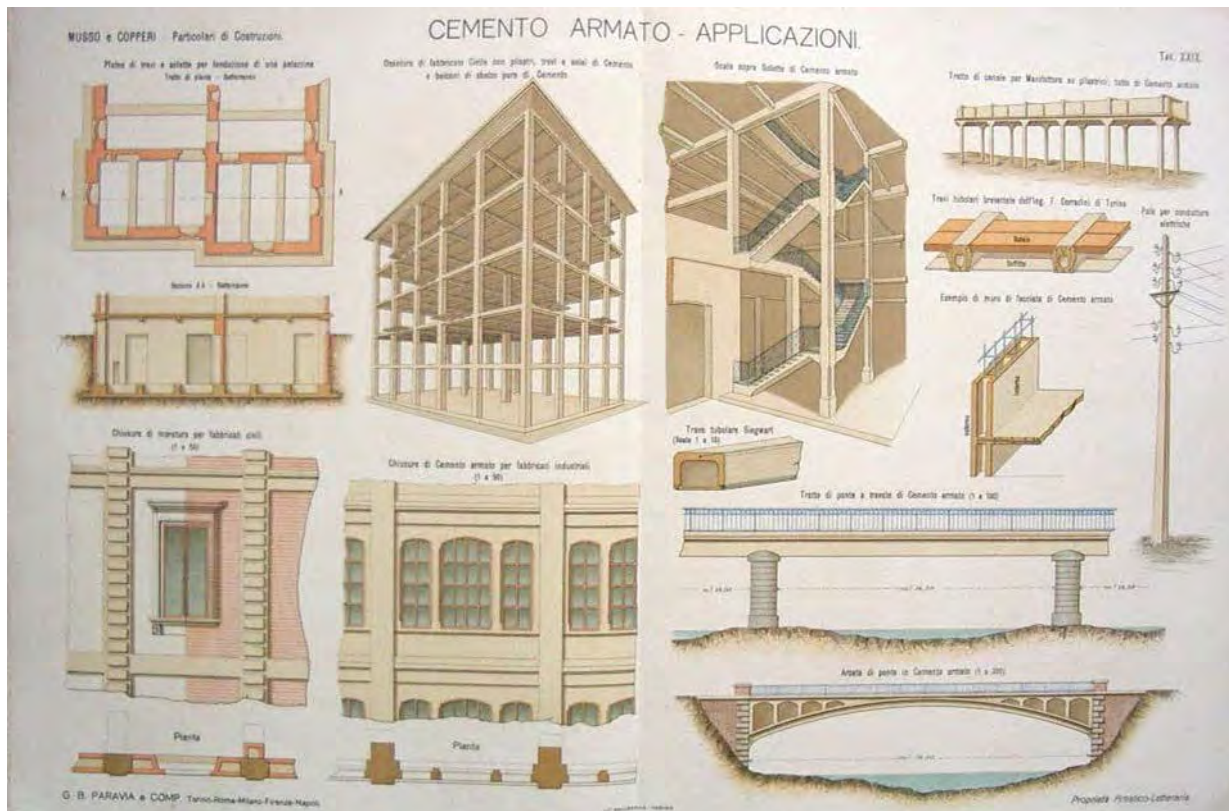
Musso and Copperi's: Details of wall construction. Table XXIX Concrete - applications.
